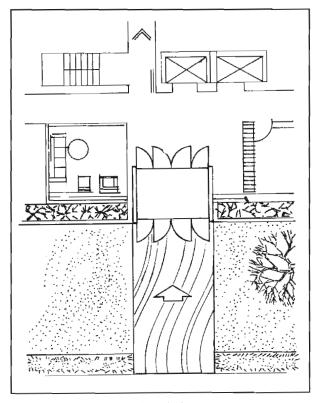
As much of a building's lobby area as possible should be visible from street or entry way
